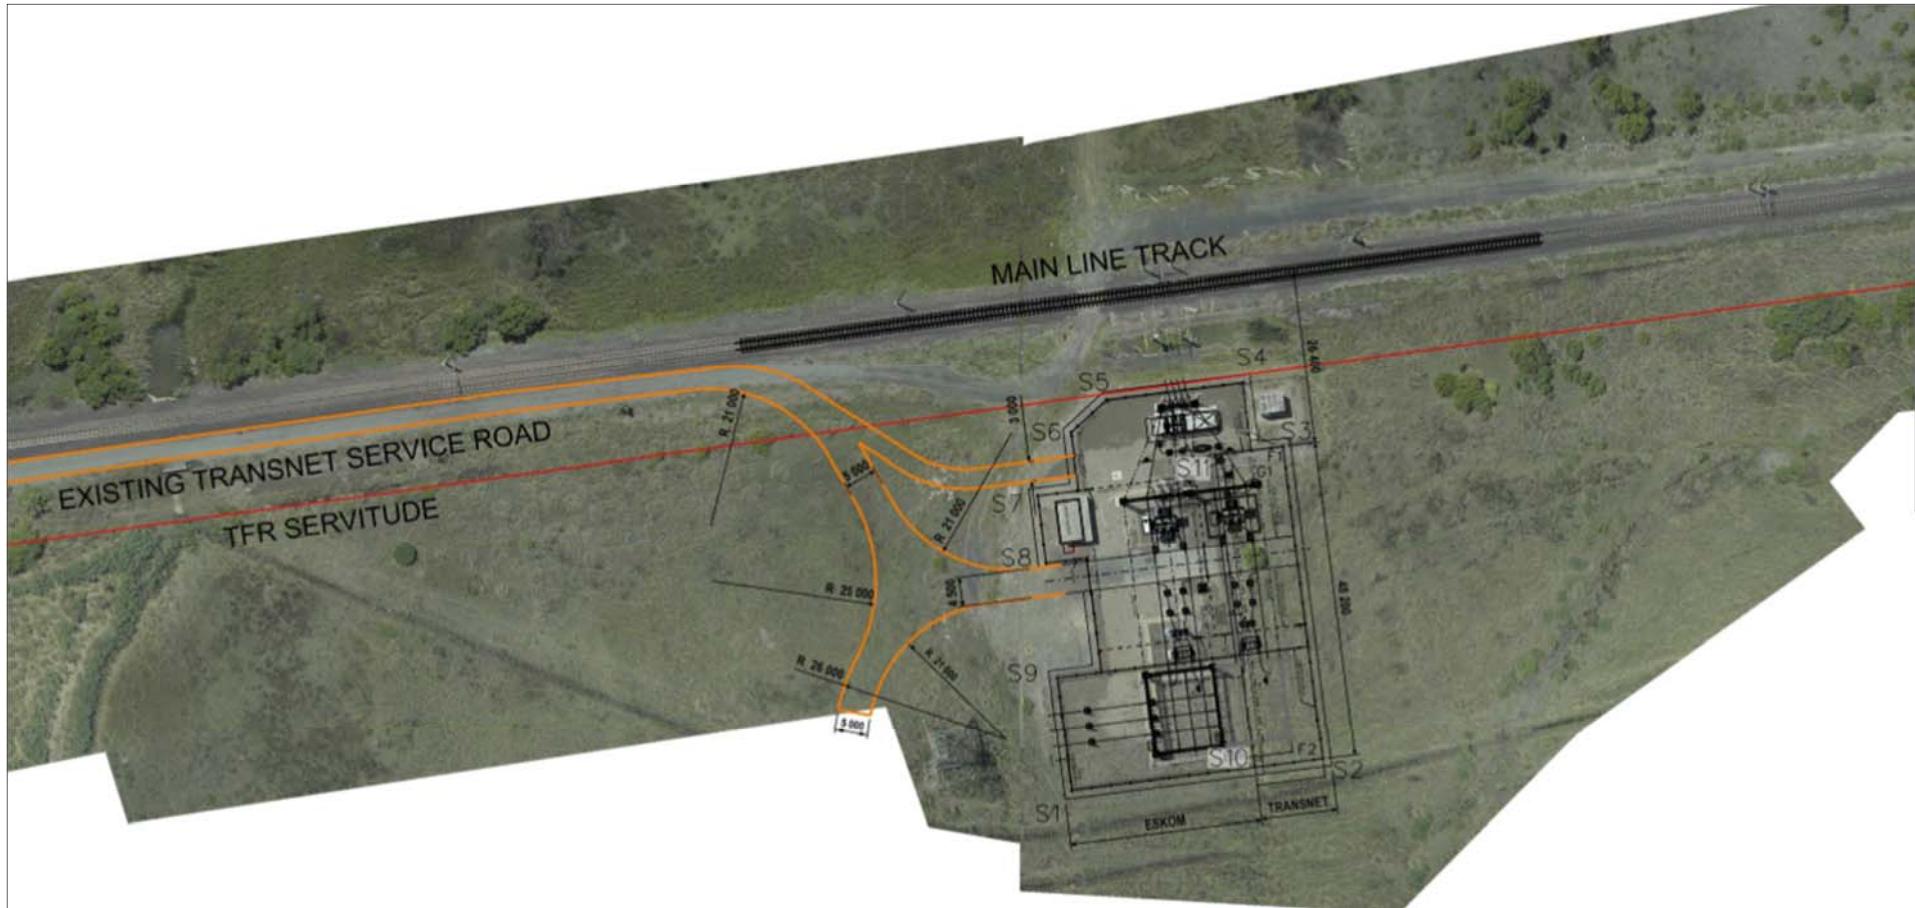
Schematic layout of the Proposed Turfgrond Substation Expansion
